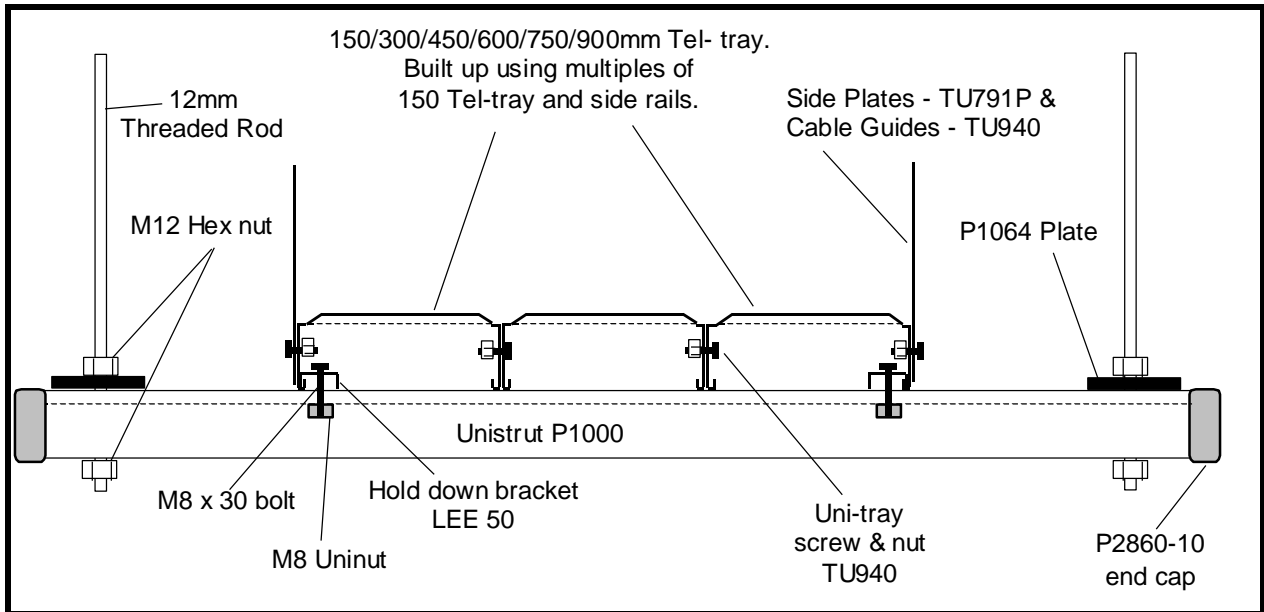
Detailed View of Ceiling Support using Tel-Tray
